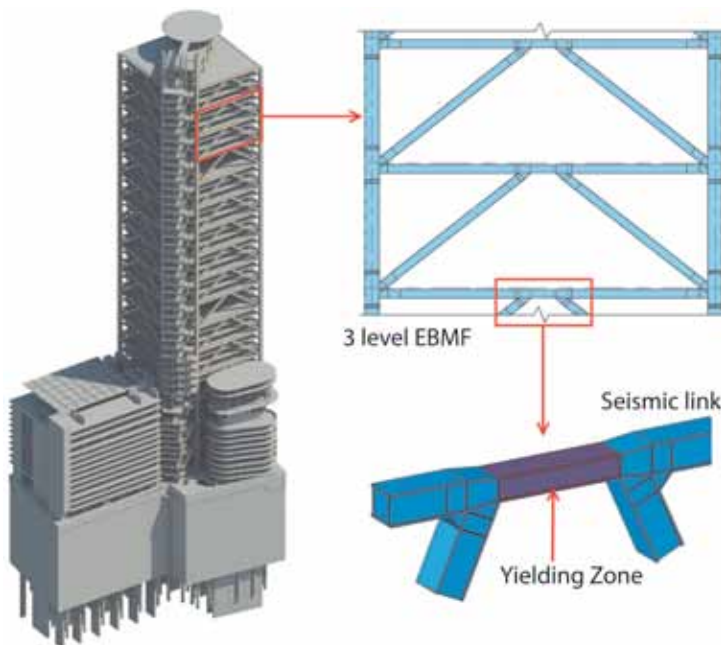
Overview of Eccentrically Braced Megaframe (EBMF).
